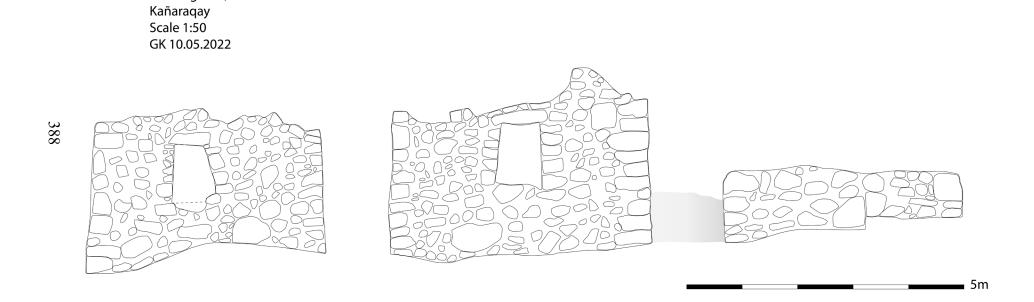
Outside elevation of the North wall of Building NC7, Kañaraqay
